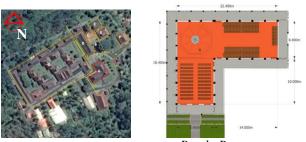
Site plan and Floor Plan Bunda Pemersatu
